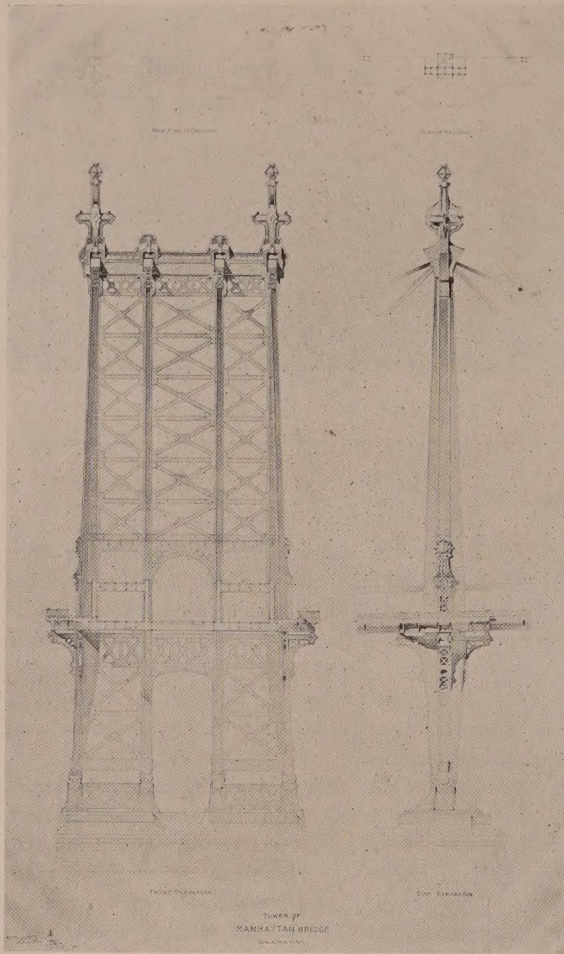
FRONT AND END ELEVATION OF THE MANHATTAN BRIDGE TOWERS.
